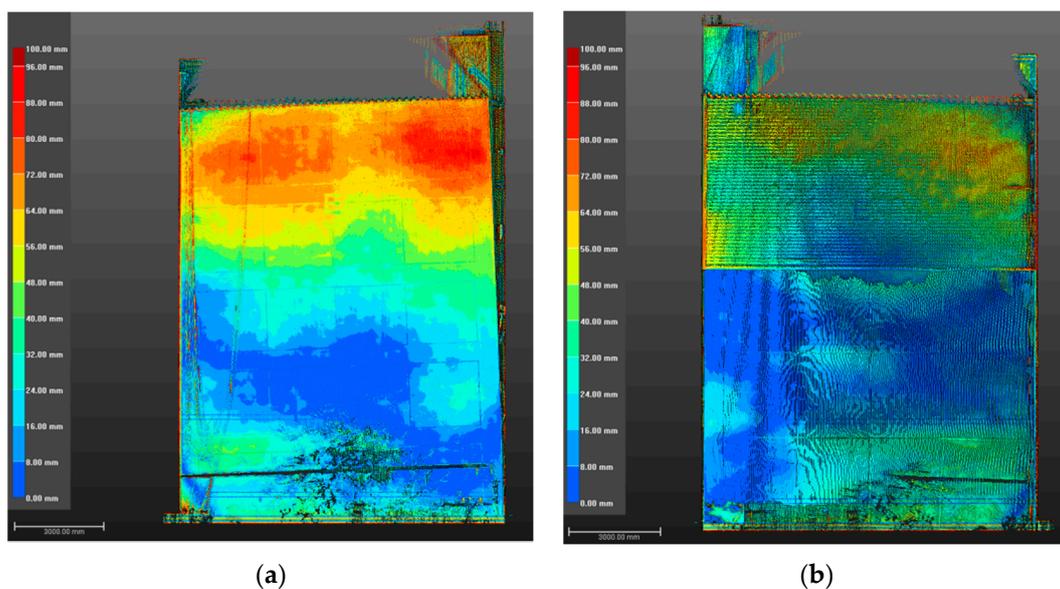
Smoothness analysis results for Building E's east and west walls. (a) Analysis of Building E's west wall; (b) Analysis of Building E's east wall.
